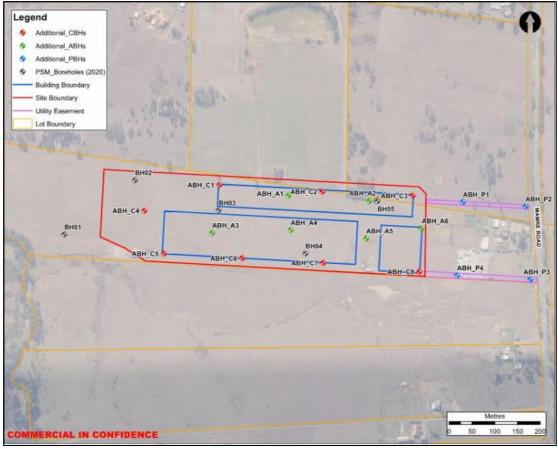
Borehole Location Plan (Source: ARUP, 2021)
